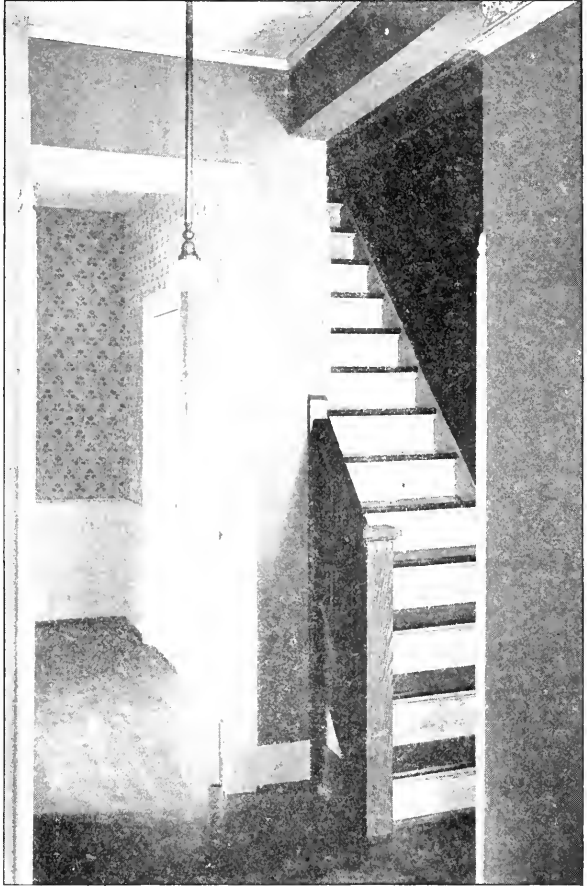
An old interior remodeled. Woodwork painted white. New oak floors laid over old pine ones. Farther room was formerly an old kitchen, now a bedroom, with white wainscot and a quaint wall paper in green tones
